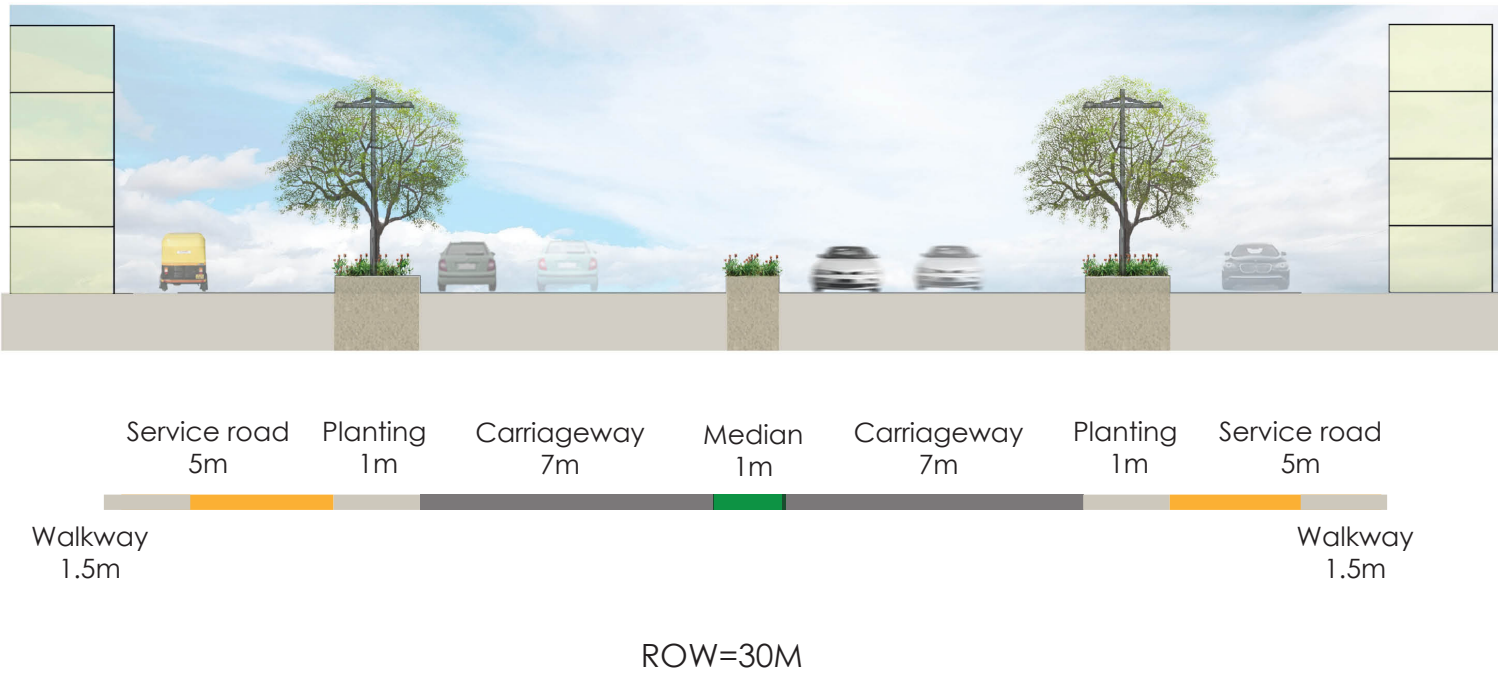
Proposed Typical Section 30 mts. ROW Road
